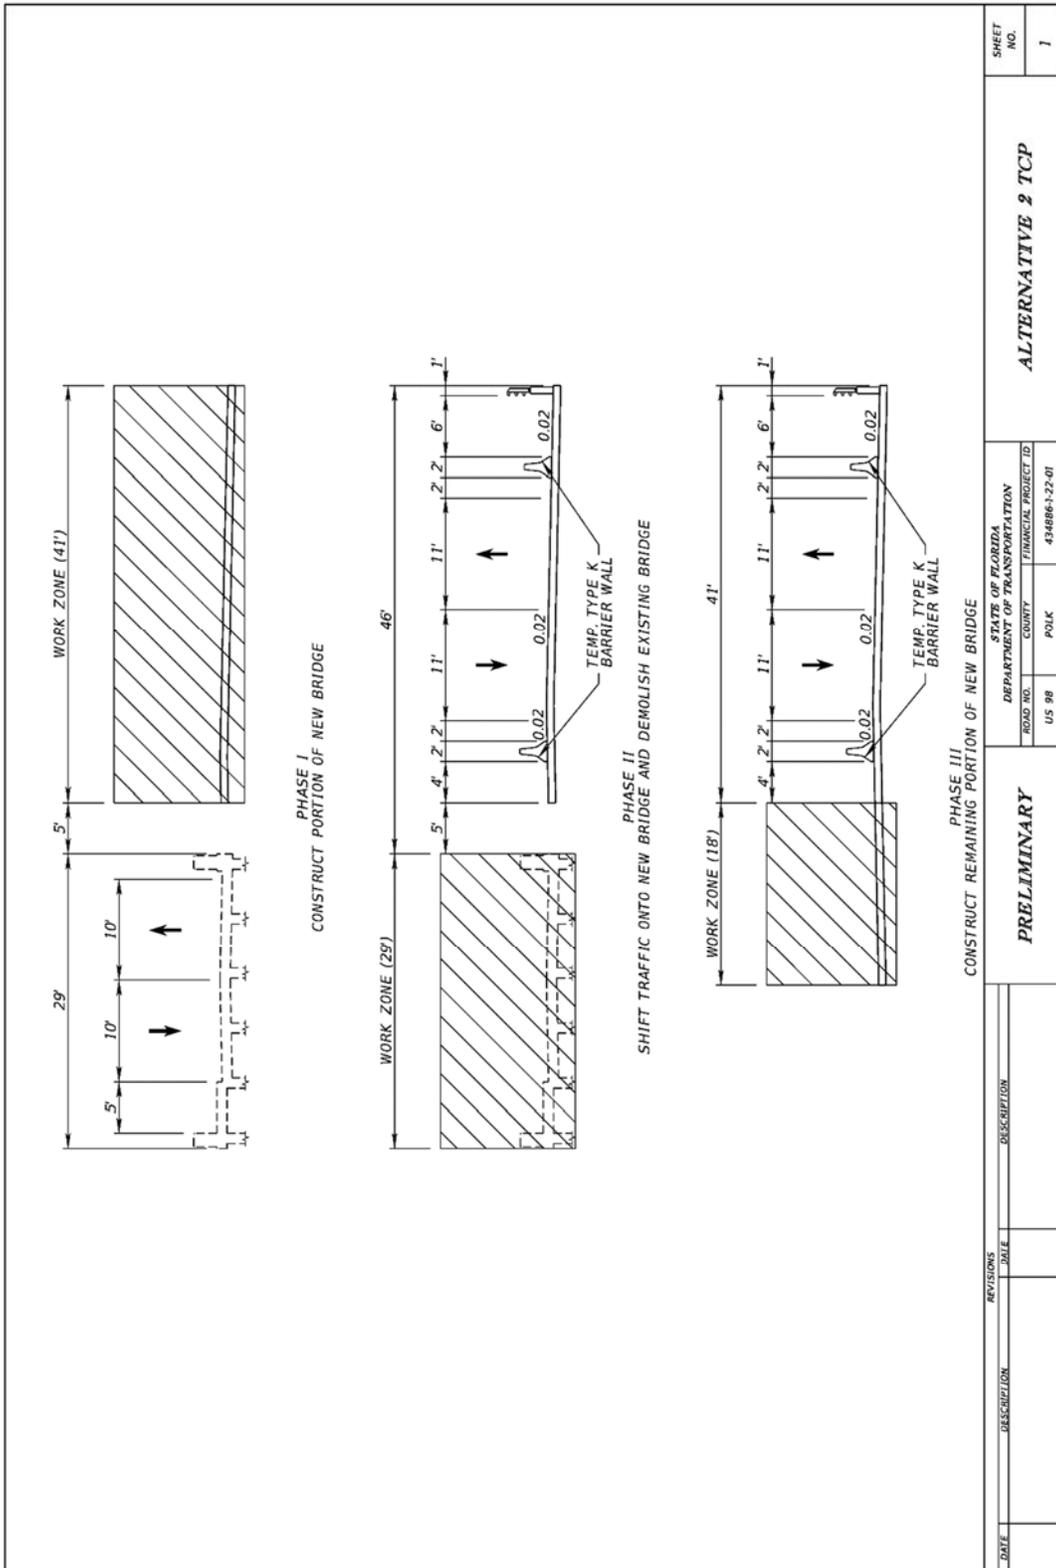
TEMPORARY TRAFFIC CONTROL PLAN FOR THE PREFERRED ALTERNATIVE
